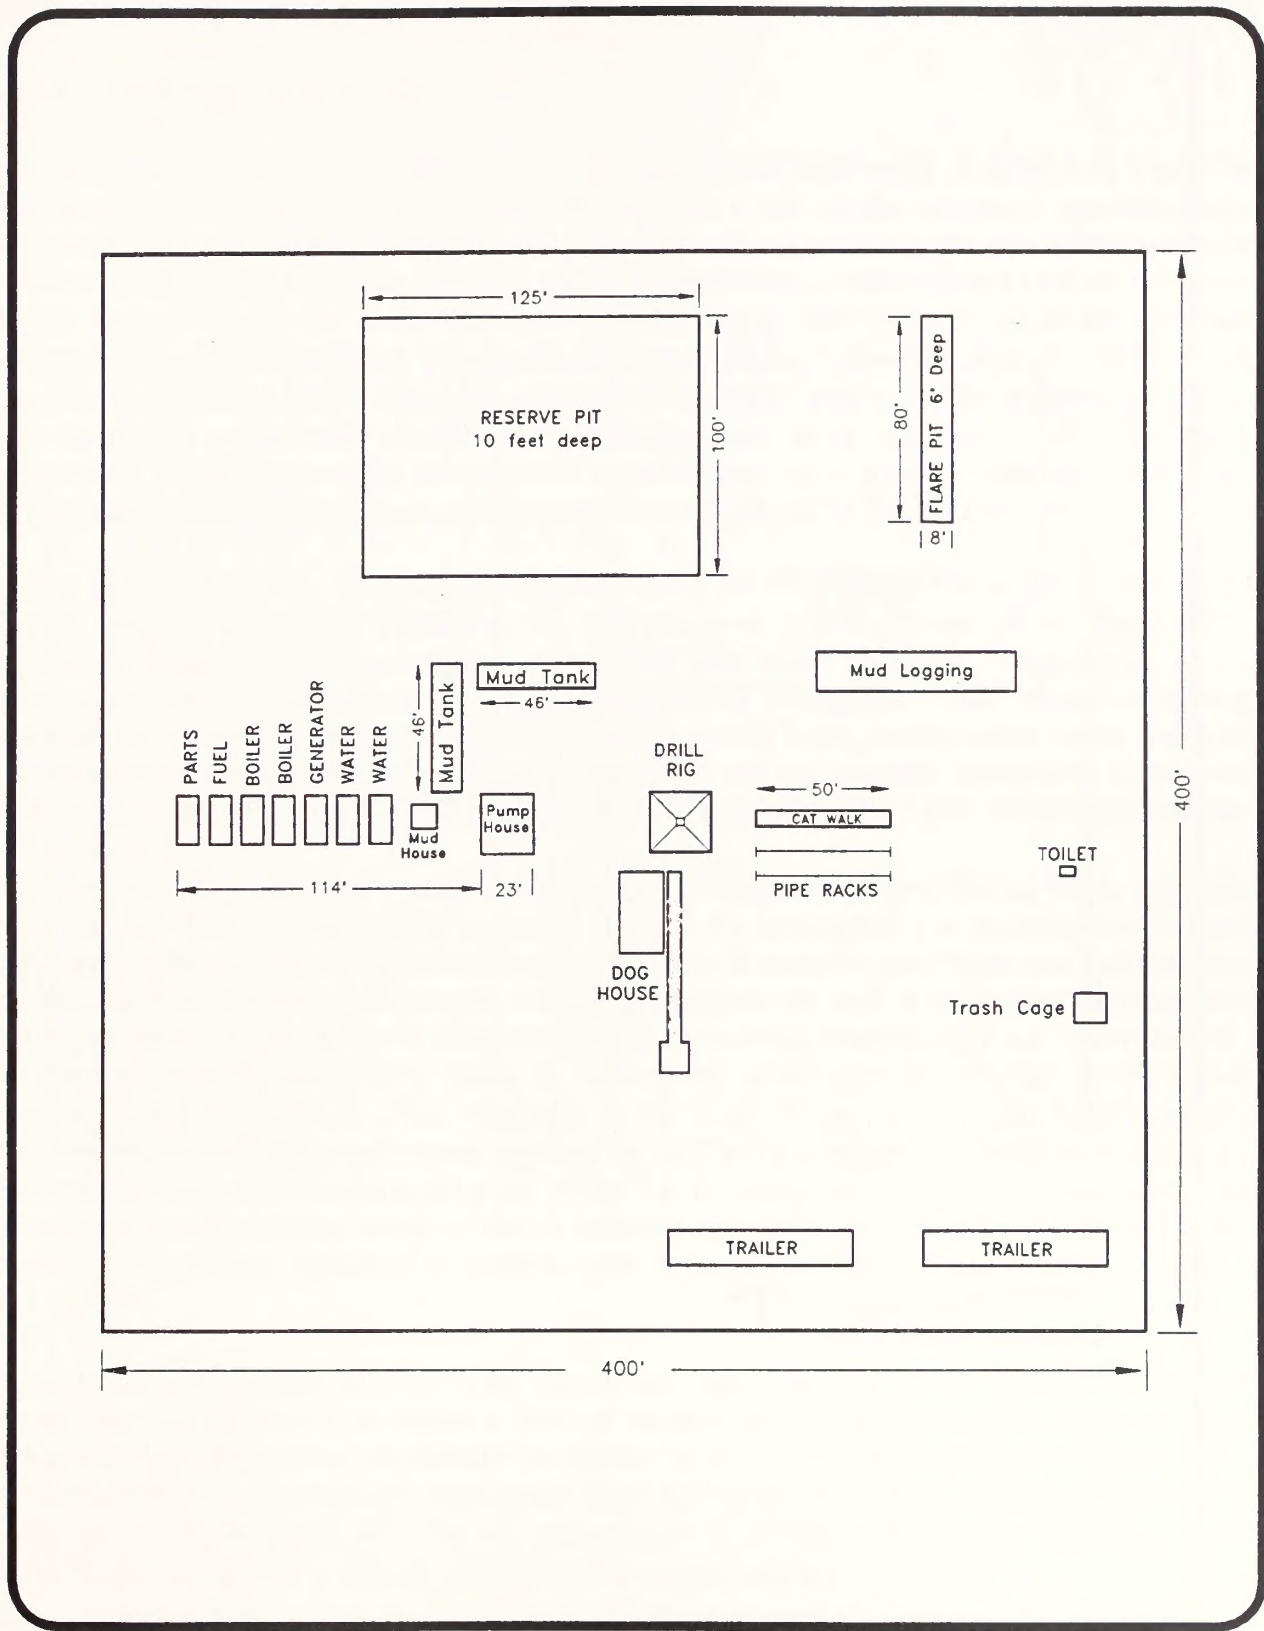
Typical Drawing of a Traditional Single-well Pad.
